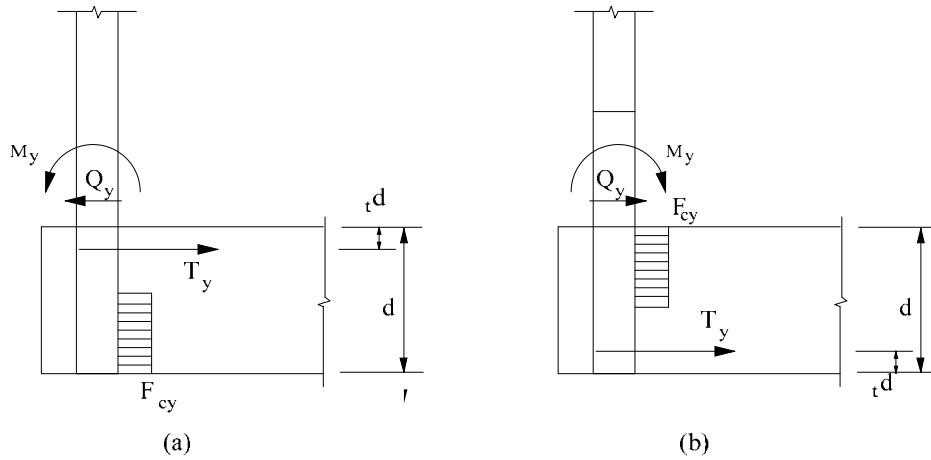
Plastic bearing stress distribution on the foundation and tension forces on the steel reinforcement [after AIJ (2001)]
